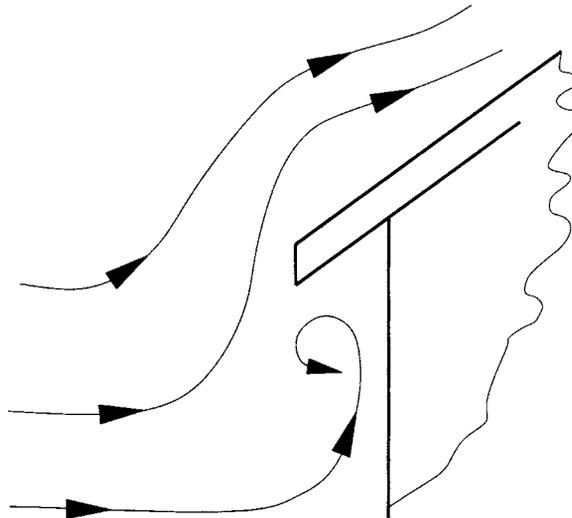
Roof overhang restricts airflow, creates large local forces on the structure.
